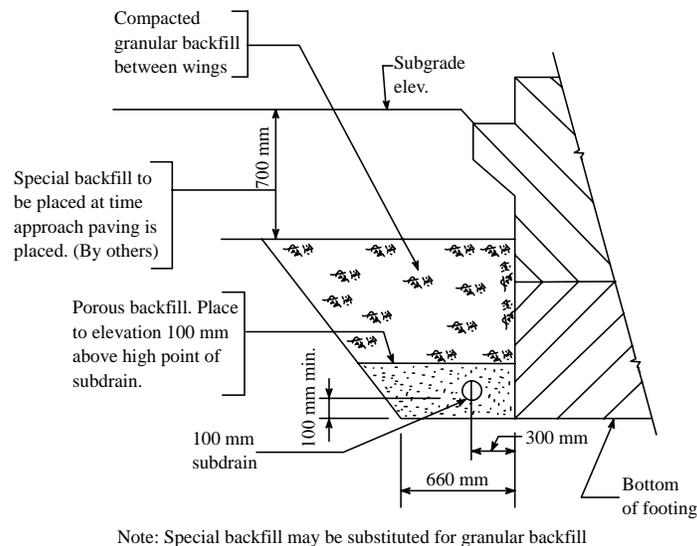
Typical Iowa DOT subdrain design (Iowa DOT Bridge Standards 2005)
